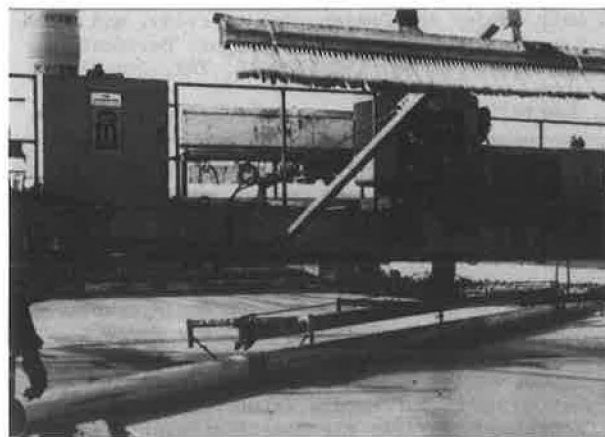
Space shuttle landing facility at KSC with slip-form paving equipment, leveling tube, and longitudinal broom.
